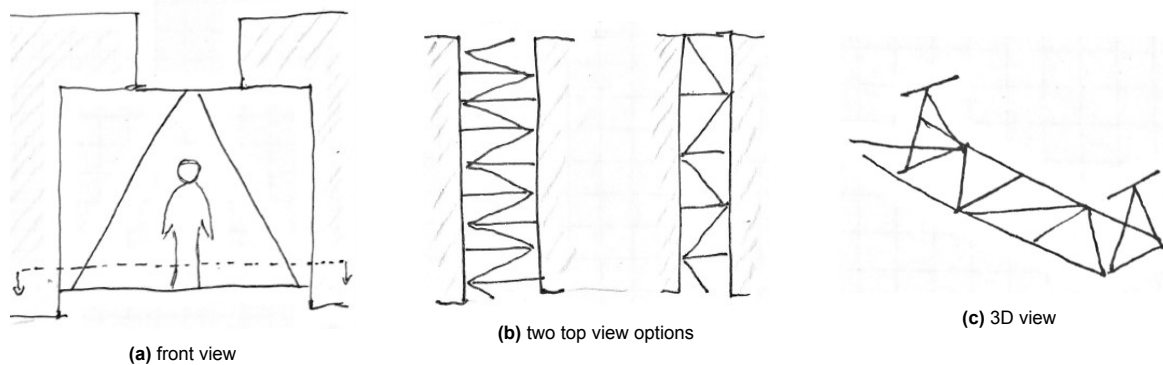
Sketches of a conceptual diaphragm structure between the box girders.
